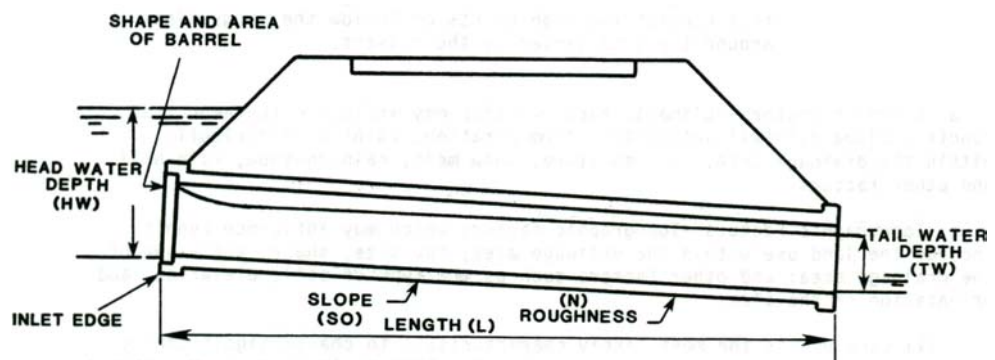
Factors Affecting Culvert Discharge (Source: Adapted from Concrete Pipe Handbook, American Concrete Pipe Association)
